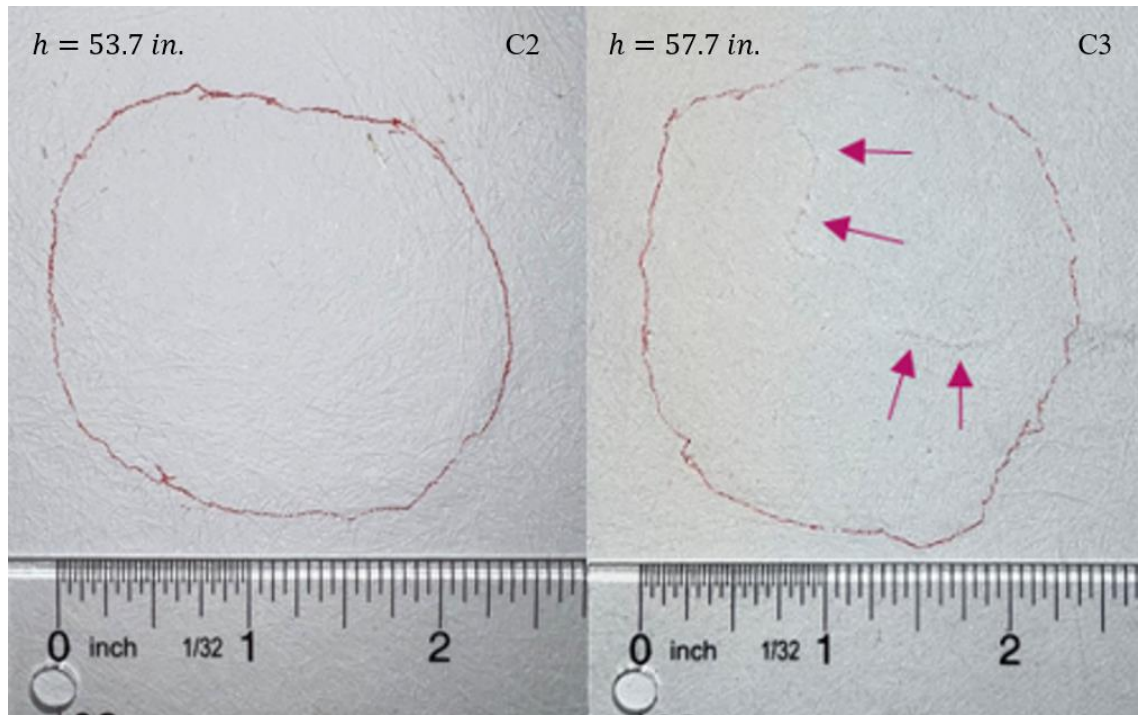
Cracks on BFCB, $h = 53.7 \text{ in.}$ & $h = 57.7 \text{ in.}$
